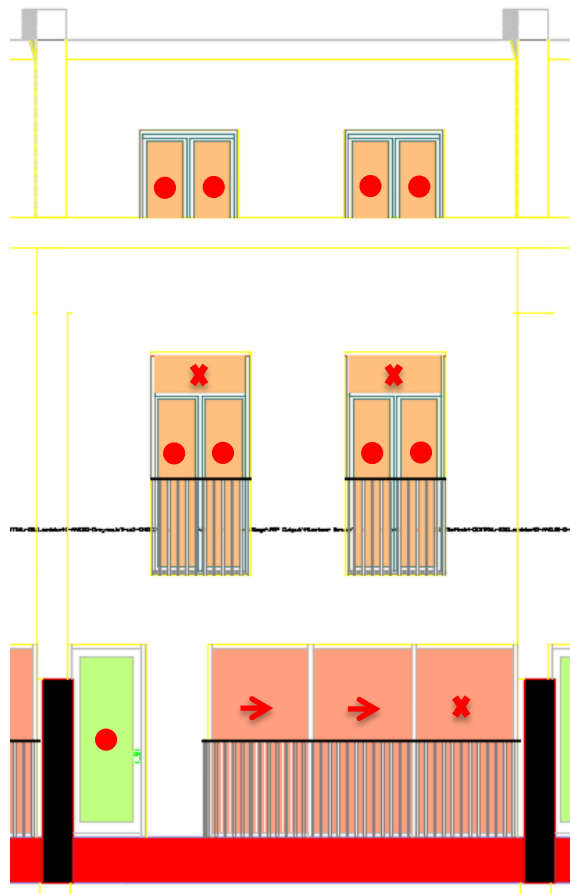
House Type 1 East Facing Elevation: Location of Openings
